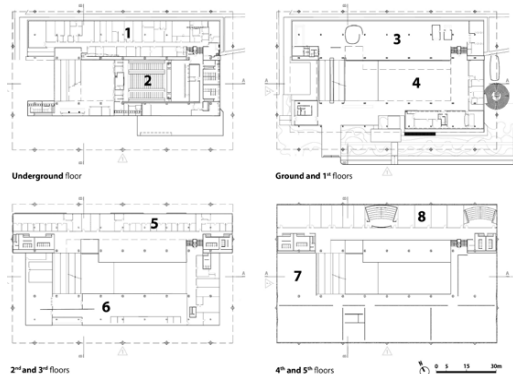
Floor plans of the Vilanova Artigas building, with the six half-levels in four plans: Underground level (1) workshop/laboratory spaces and (2) auditorium; Ground and 1<sup>st</sup> floor with (3) “museum” and (4) Salão Caramelo; 2<sup>nd</sup> and 3<sup>rd</sup> floors with (5) departments, interdepartmental studio and (6) library; 4<sup>th</sup> and 5<sup>th</sup> floors with (7) studios and (8) classrooms.
